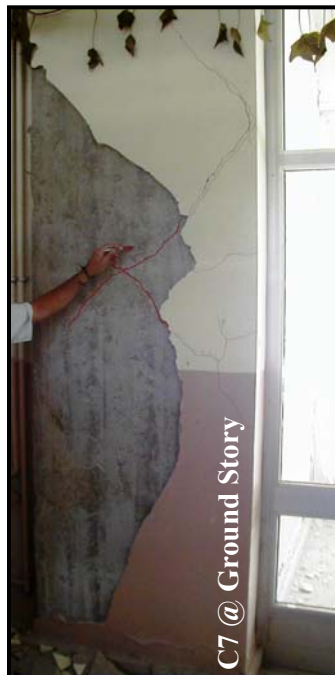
Shear cracks in the ground story column-C7 (Bolu)
